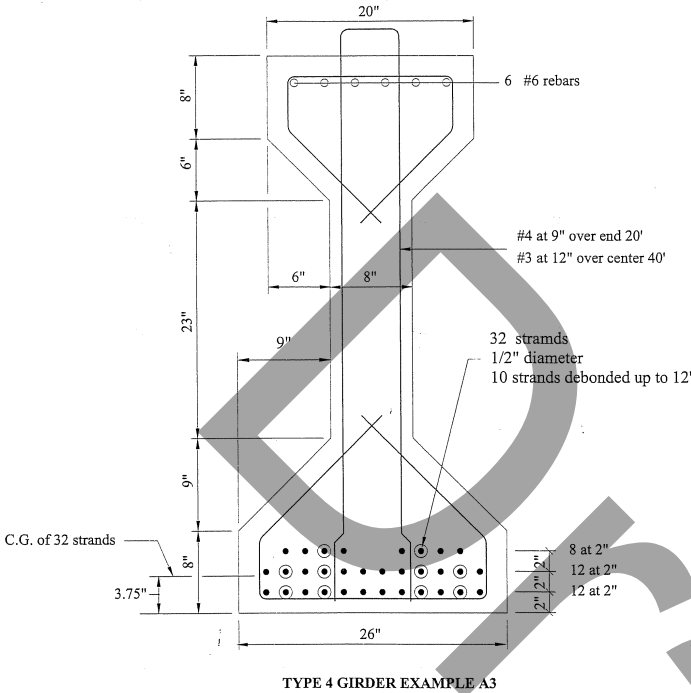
Cross Section—Interior Girder AASHTO Type 4 I-Girder
